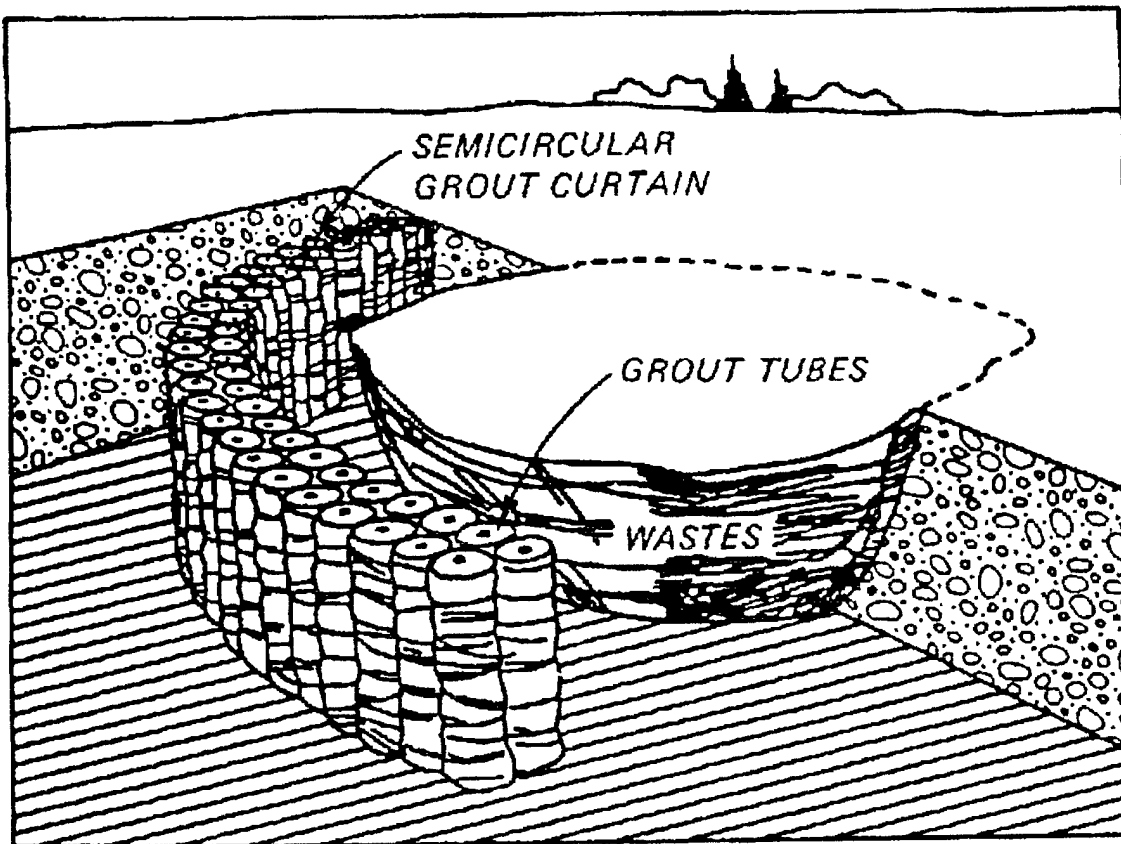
Semicircular Grout Curtain Around Waste Site
